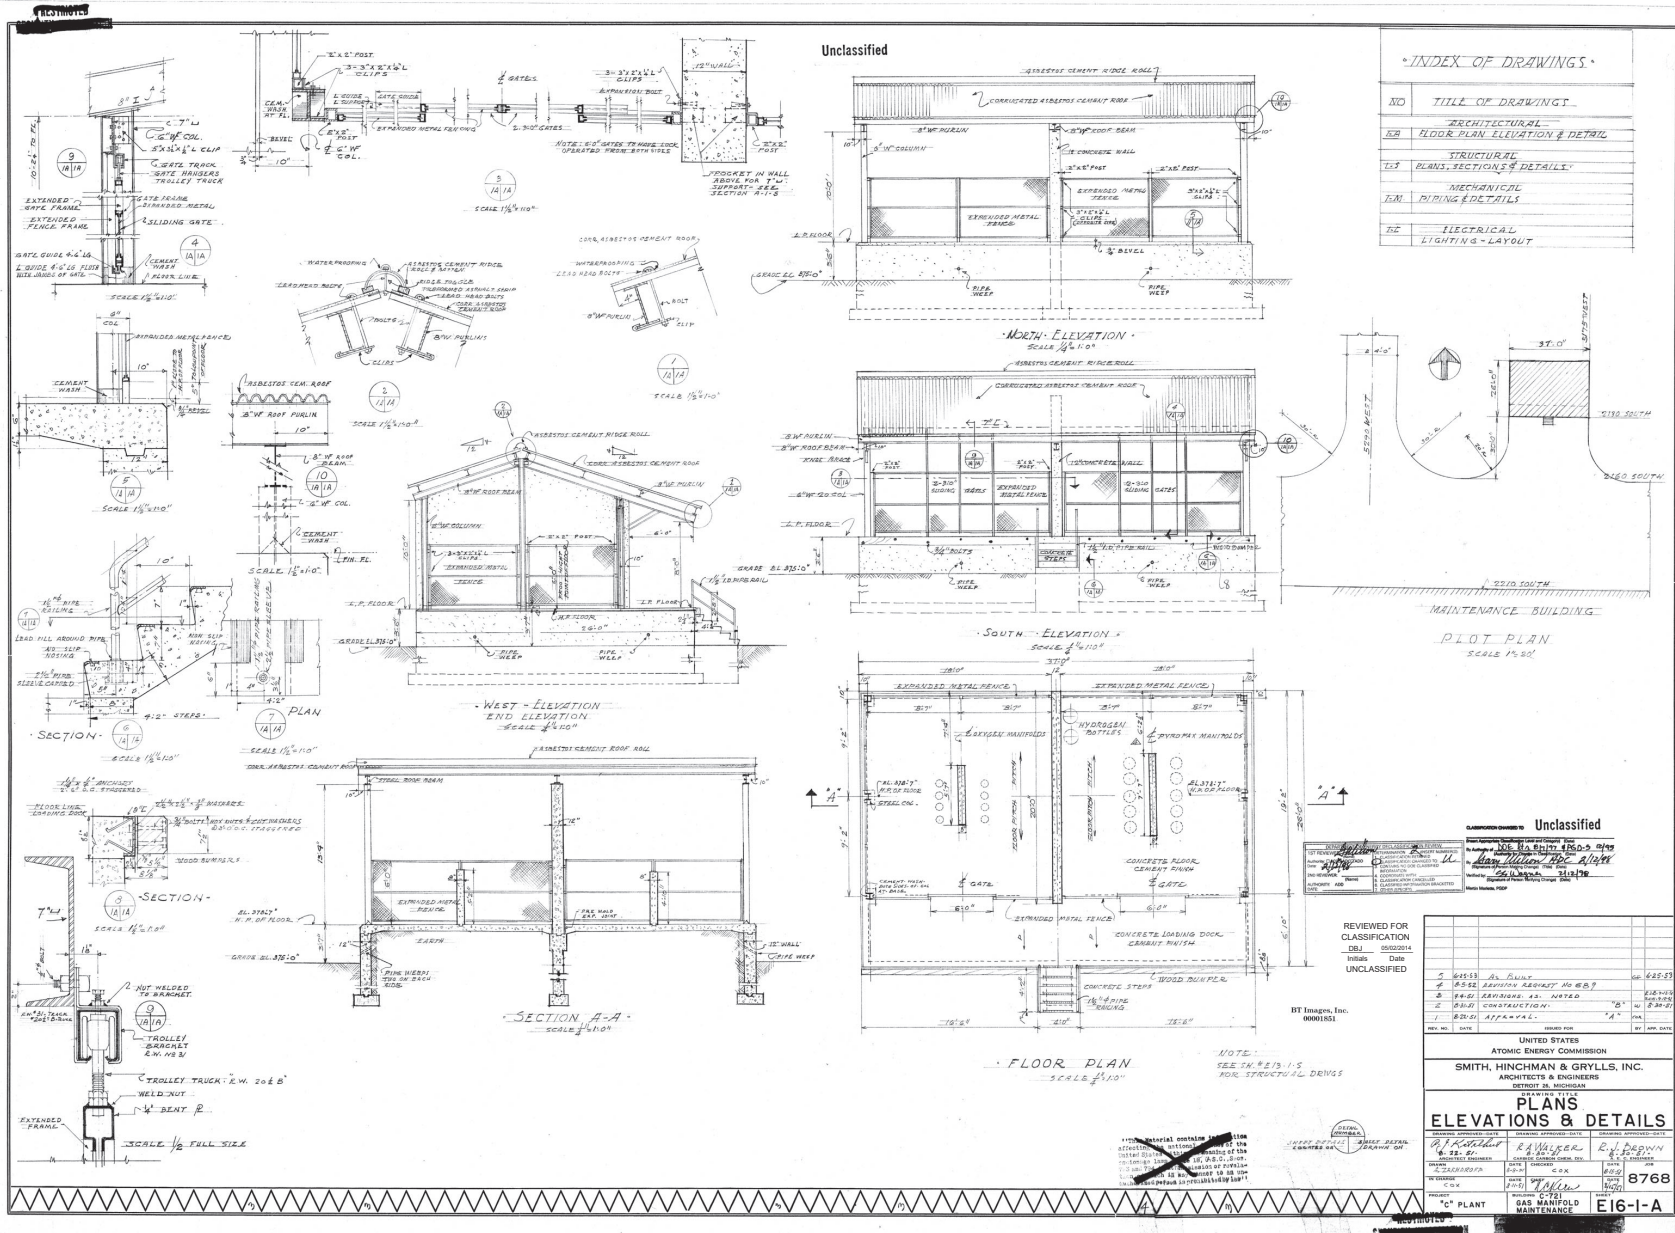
Engineering Drawing E16-1-A "Plans Elevations & Details"
